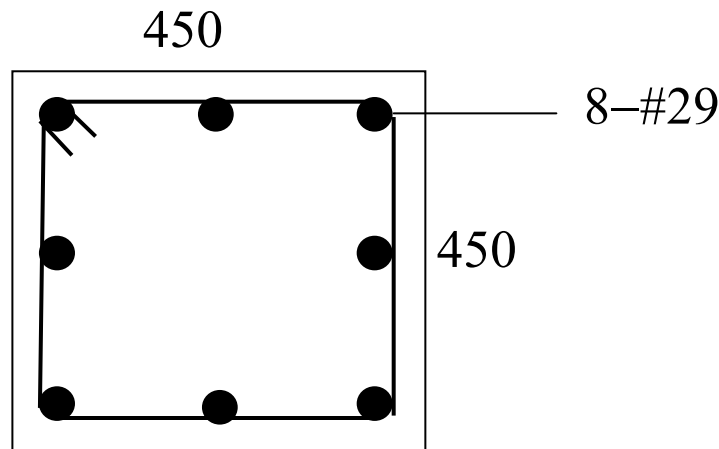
Reinforcement Details For Column of Example 14.8.
